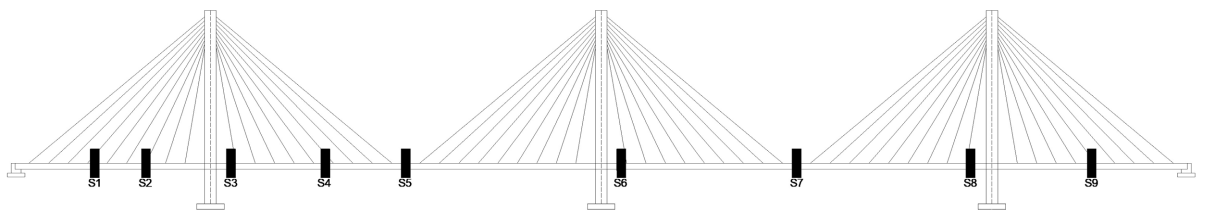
Schematic diagram of the cross-sectional layout of the stress measurement point of the main beam (test section)
